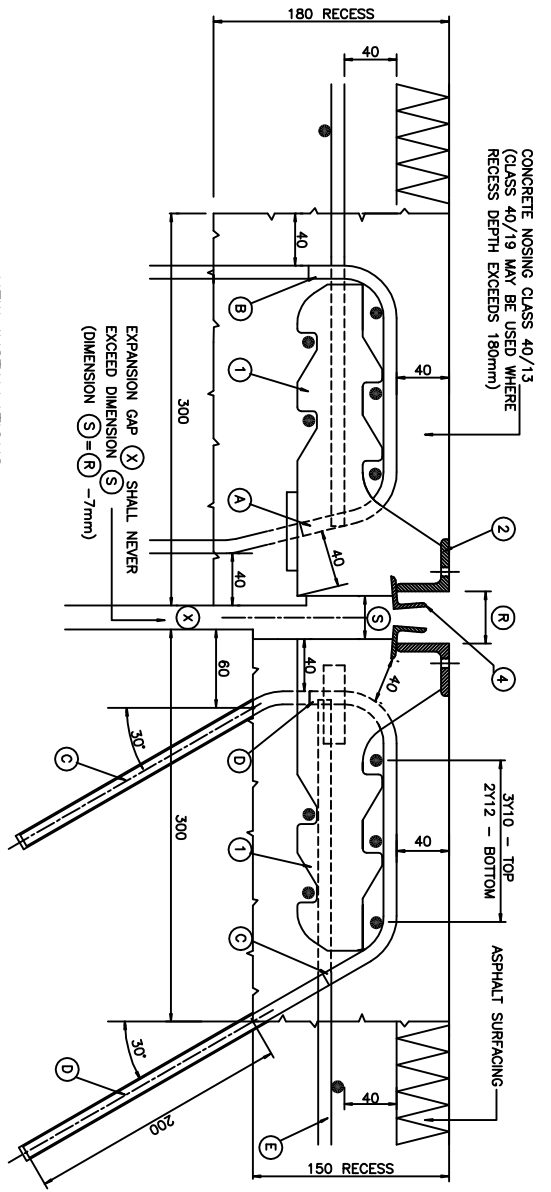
PROFILE AND ANCHORAGE
